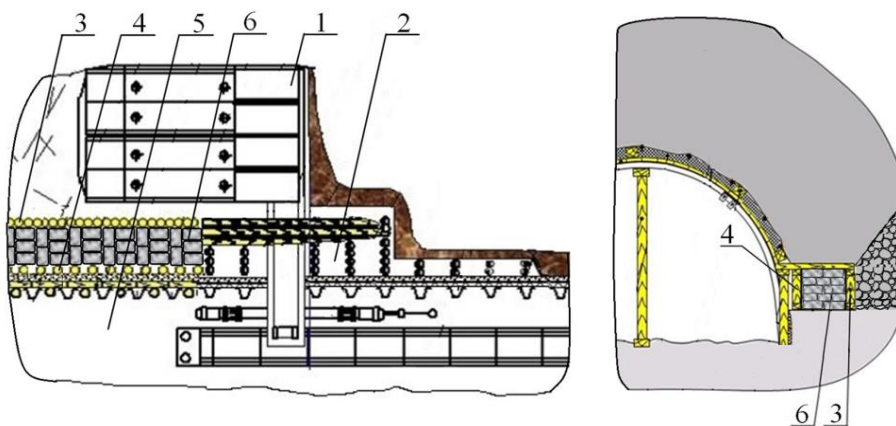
Technological diagram of the construction of a packaged wall: 1 – mechanised longwall fastening, 2 – excavation longwall, 3 – organic fastening from the side of the produced space of the longwall, 4 – organic fastening from the side of the district roadway, 5 – district roadway, 6 – packaged wall
